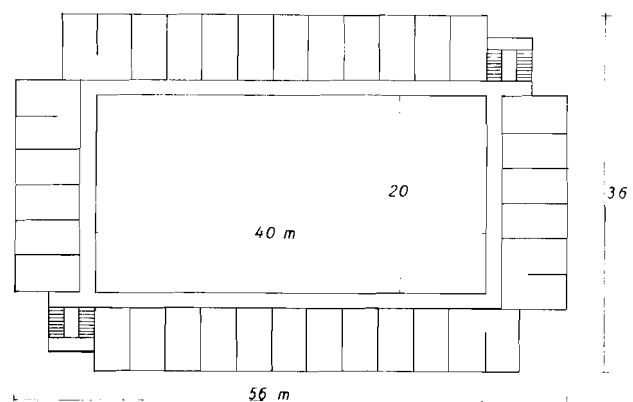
House block (plan arrangement) 28 single, 4 double dwellings
